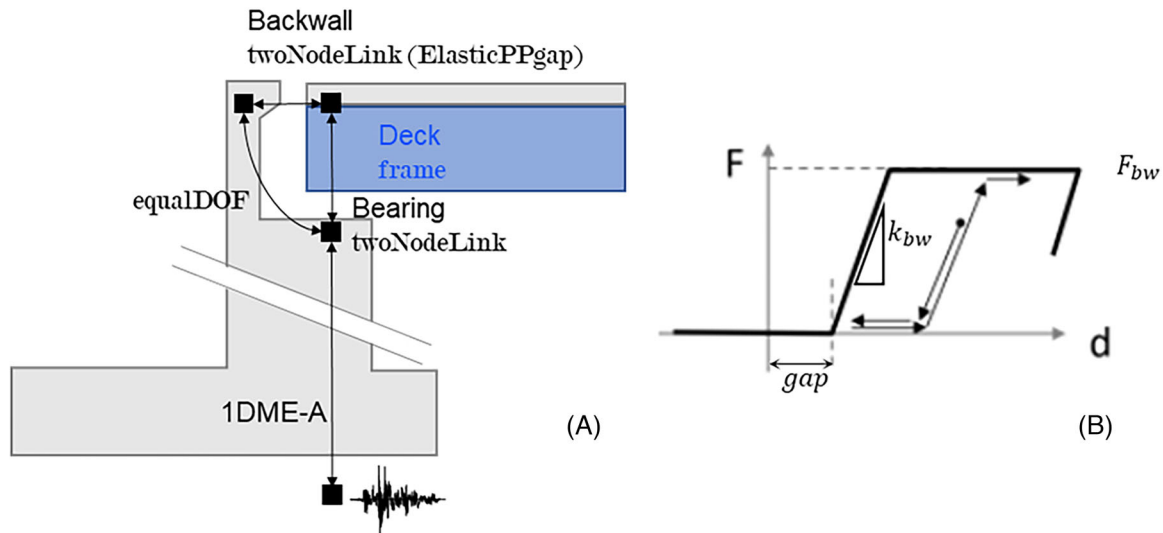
Deck-abutment connection through bearing and gap elements: (A) general arrangement, (B) backwall force-displacement law.
